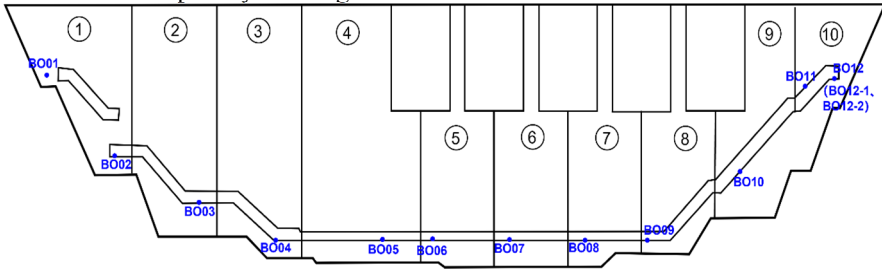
Layout of uplift pressure measuring holes for dam foundation gallery
